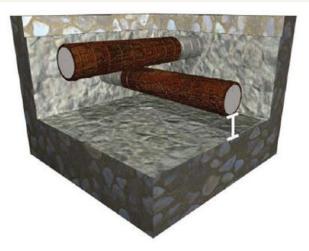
When multiple reinforcing bars are corroded, concrete must be removed around the bar and where the bar has lost bond with the existing concrete, as shown in the right image. This ensures future protection of the bar. Figure: Structural Technologies.
